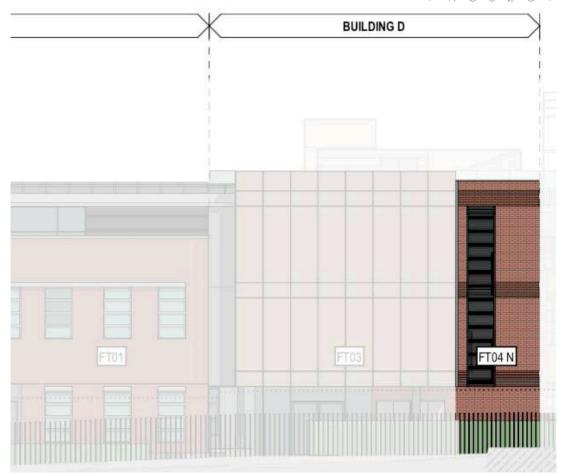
Building D Staircase, north elevation, exposed brickwork, horizontal metal battens and spacers (Source: FJMT, DA-5903 Facade Diagrams FT04 N/FT04 W Building D, 18.12.19)
